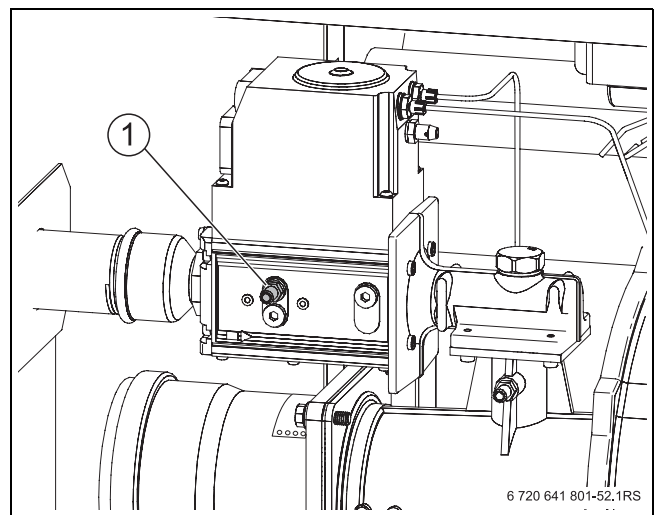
Checking the gas supply pressure (boiler size 200 to 280 kW)
